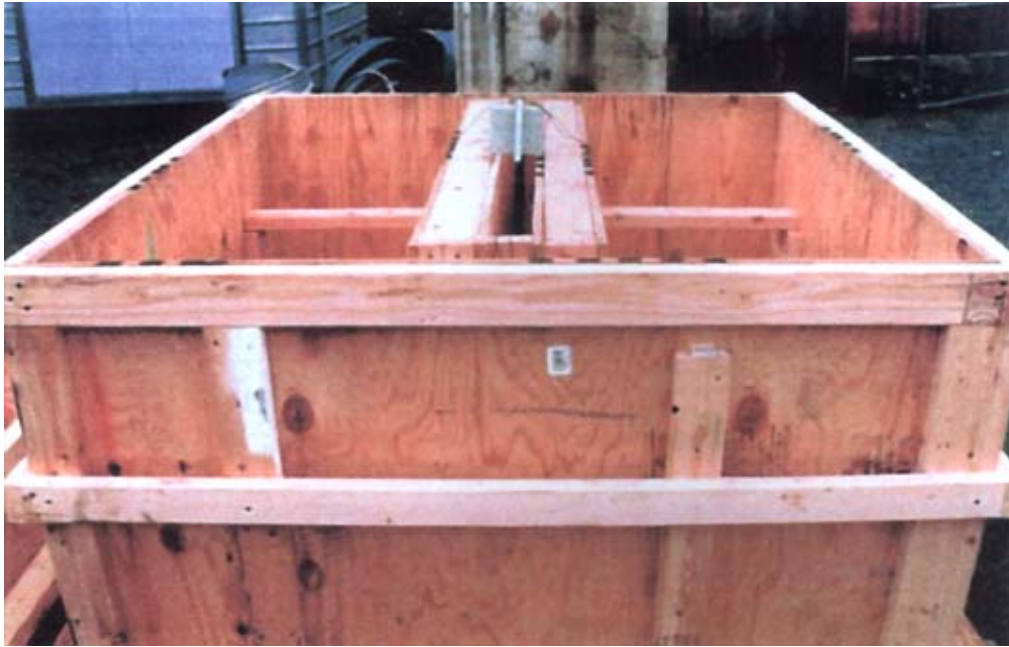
The 44" pulling iron for septic tank. Note block out in form that caused the pulling iron to be embedded in 3" thick wall of concrete.
